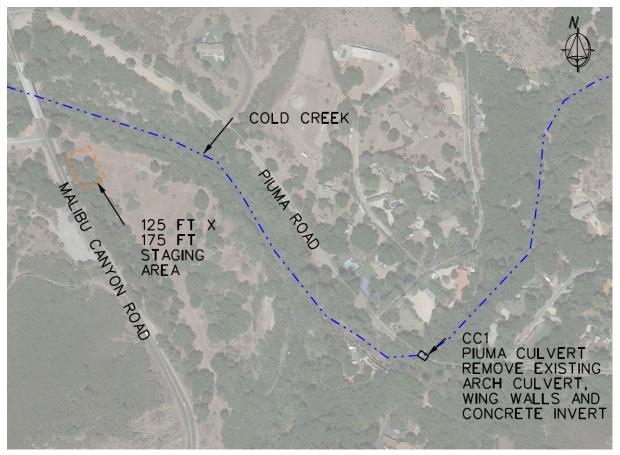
CC1, Piuma Culvert Schematic Design Part A
